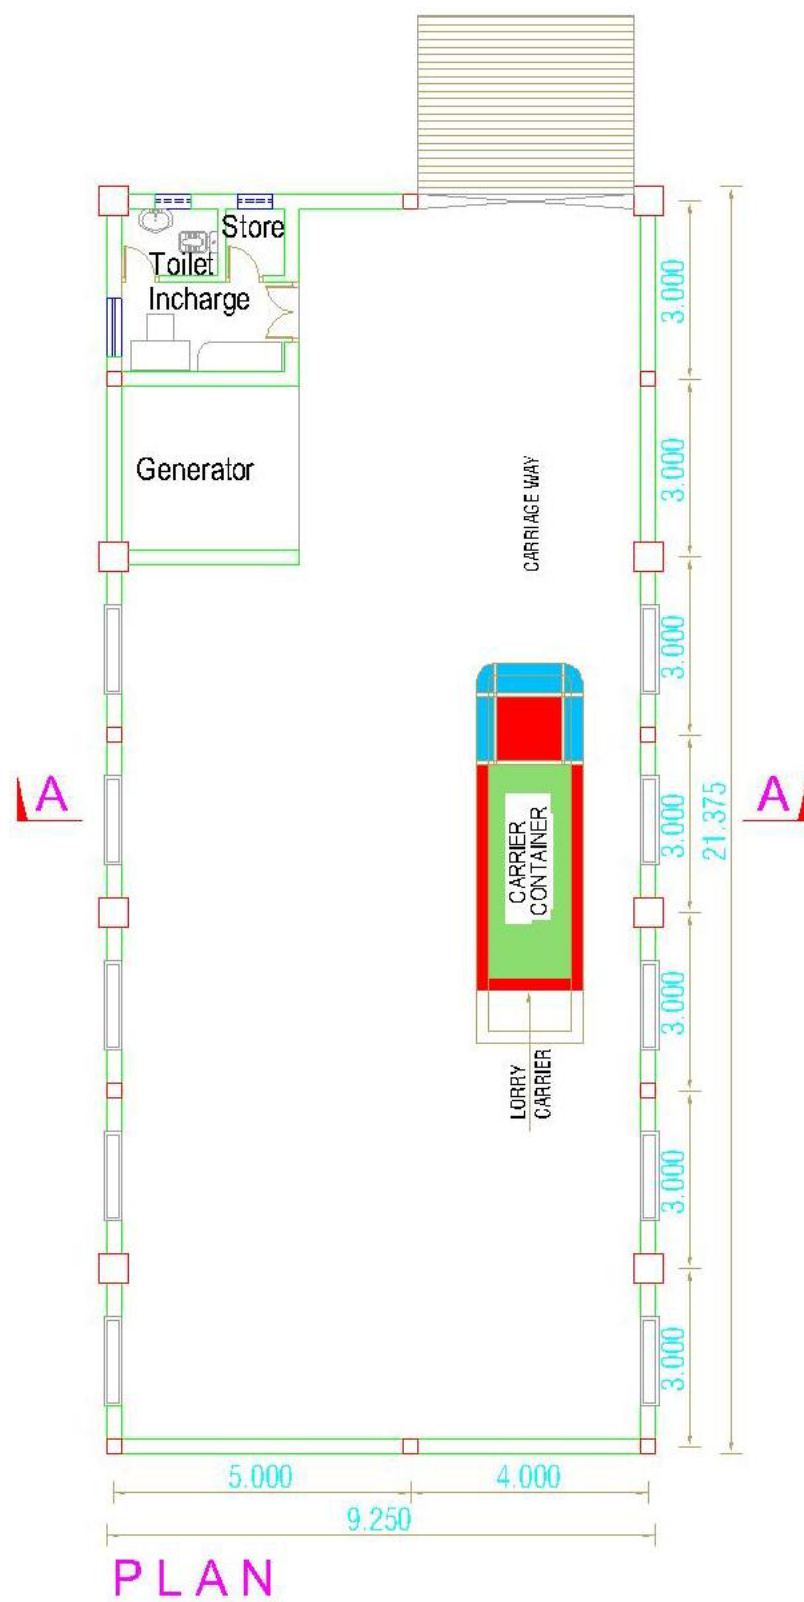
STS – 1 Sirajuddoula Road Preliminary Plan
